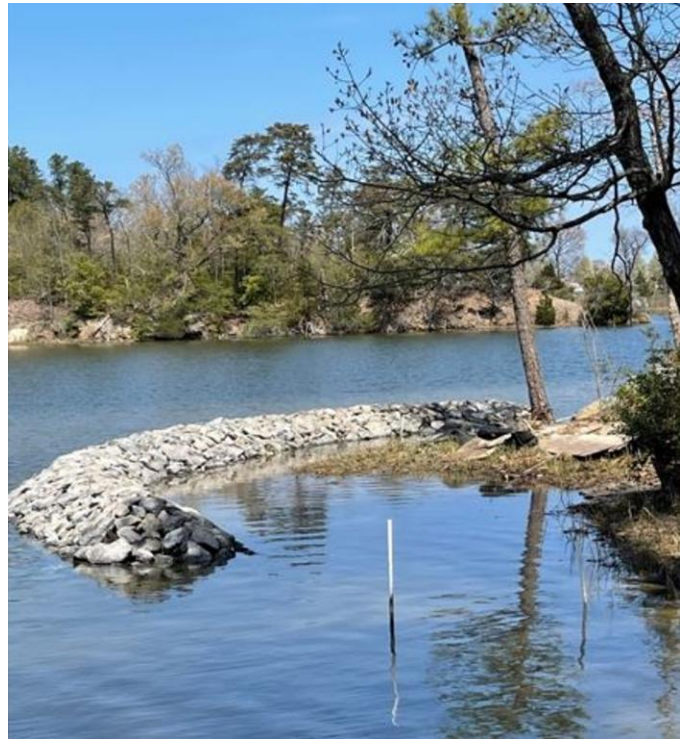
Construction of West Sill completed (April 8-12, 2021)
